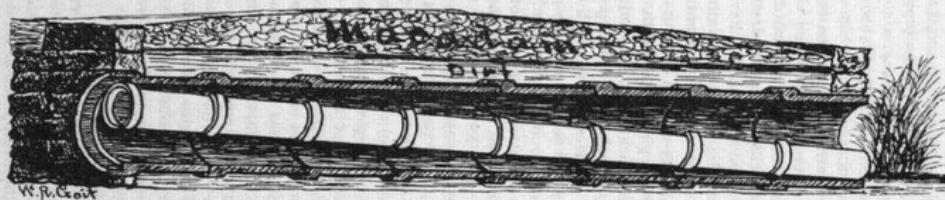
Showing cross-section of road with a 24-inch pipe culvert, twenty feet long, laid on one inch fall to the hundred feet; capacity per minute, 2396 gallons. Illustrates how a 12-inch pipe could be placed inside the 24-inch pipe culvert and a fall of thirty-six inches to the hundred feet obtained, with a capacity per minute of 2554 gallons.
